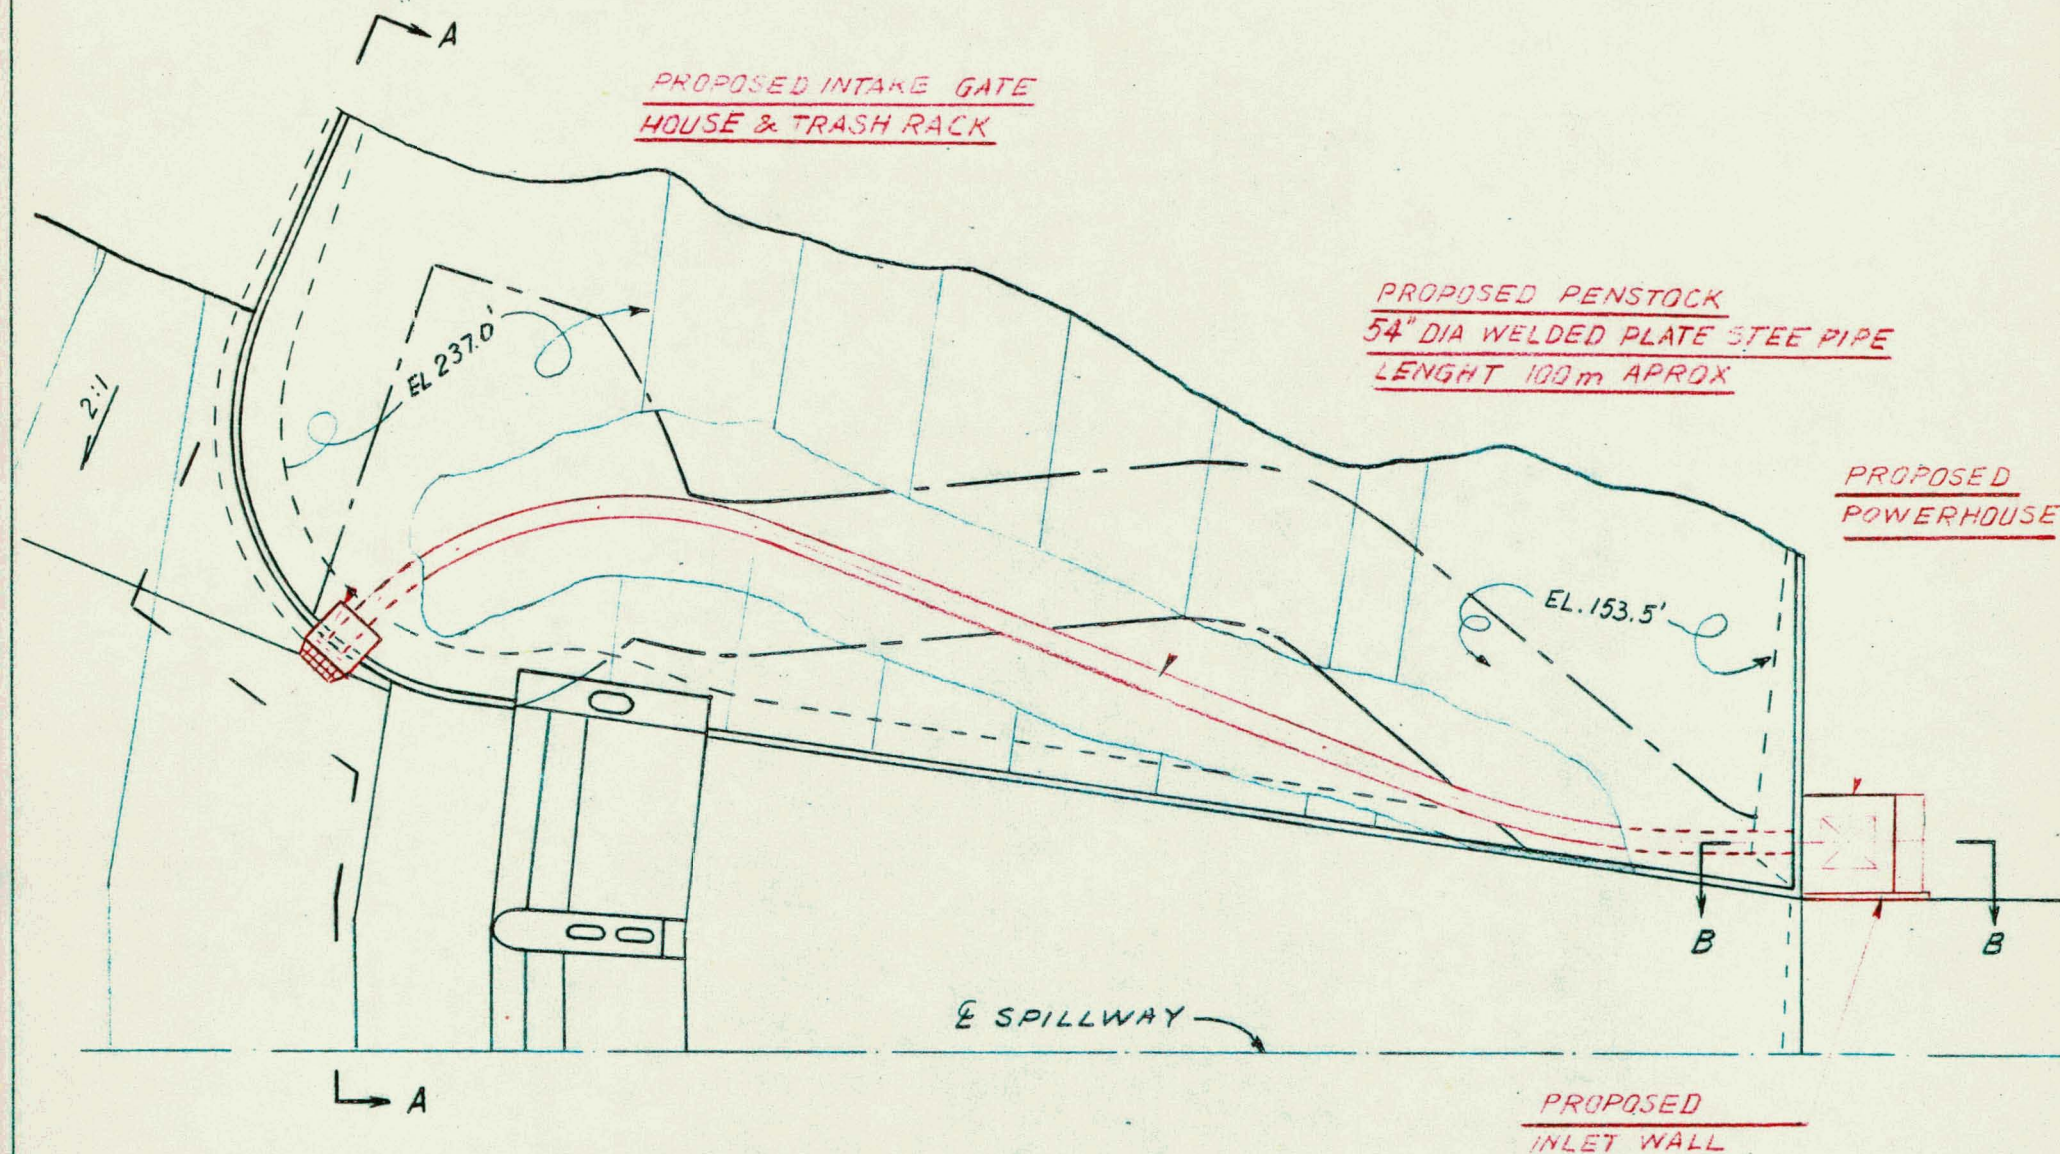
RETROFIT HYDROPOWER INSTALLATION
